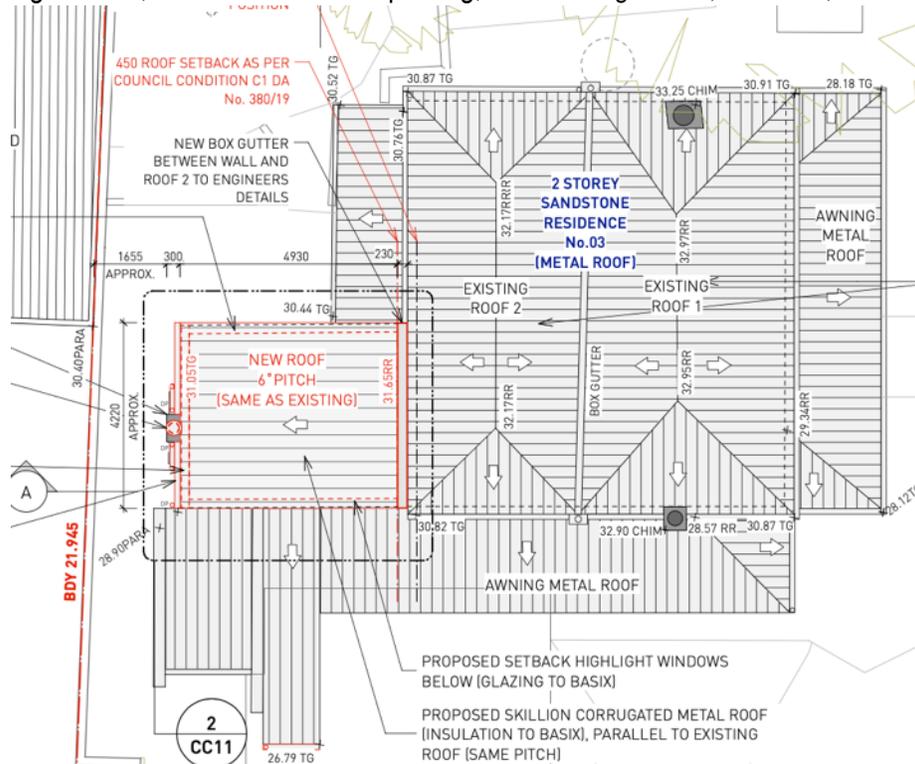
, Proposed roof plan, CC10, U+I Building Studio, 10/02/21,
